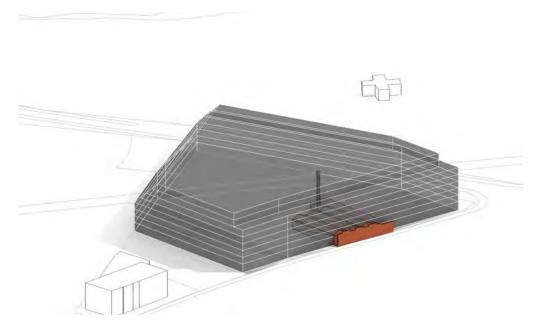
Demonstration of the 3d building envelope controls applied to the Porta site *Note: the full heritage building is to be retained. Envelope for the whole site shown for illustrative purposes only.
